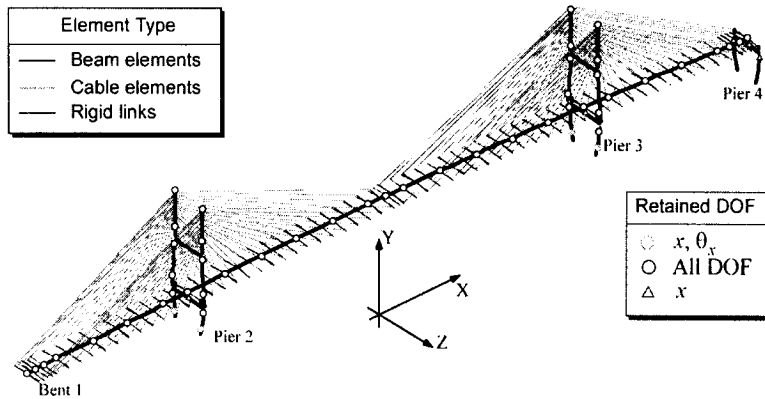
Finite Element Model of the Cape Girardeau Bridge
